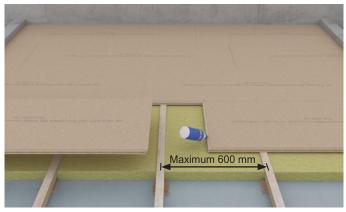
Spaandex K-floor boards mounted with flying joists and with a minimum offset of 300 mm. Spacing maximum 600 mm, see table 1.
